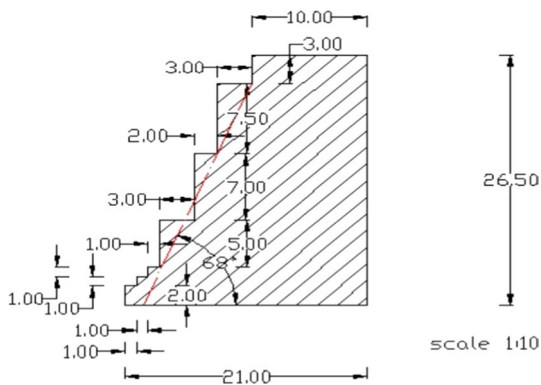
Stepped weir side view, scale 1:10, all dimensions in cm
